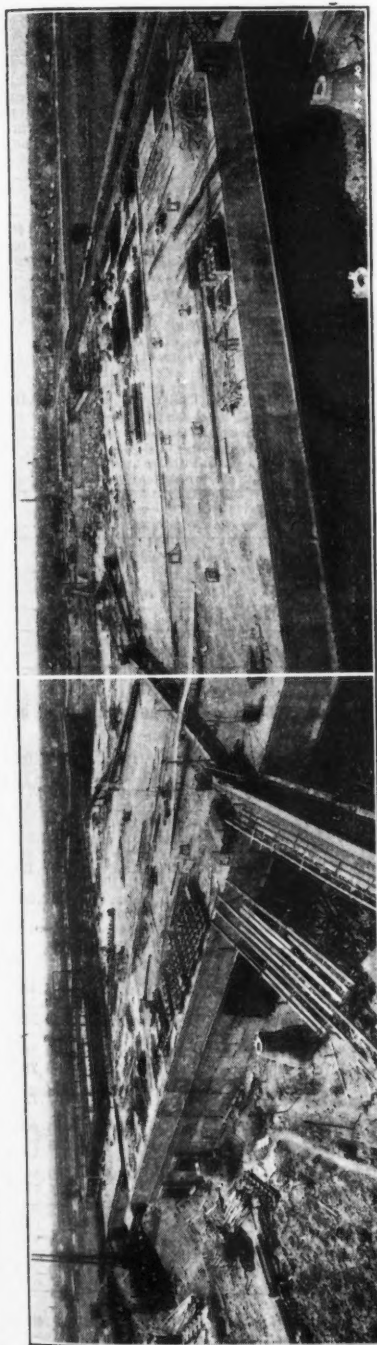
EXTENDING SETTLING BASIN; FILTER BUILDING STEEL WORK ERECTED
